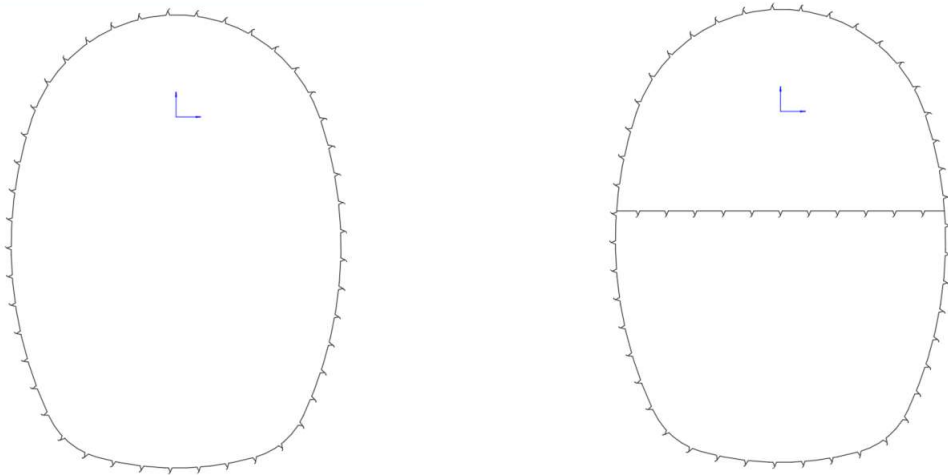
Tunnel Type 5 - Full face or phase 1 and 2+3 excavation
